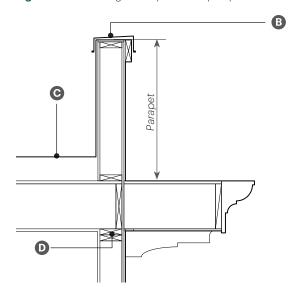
D Section detail of Highest Top Plate for parapet and flat roof.
